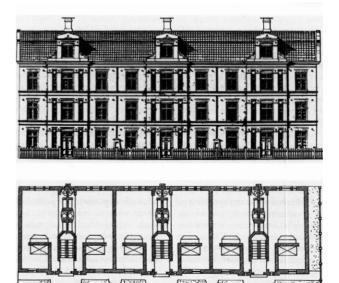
Amsterdam, Oostenburger-middenstraat, apartment building, proj. H. Han, 1852
